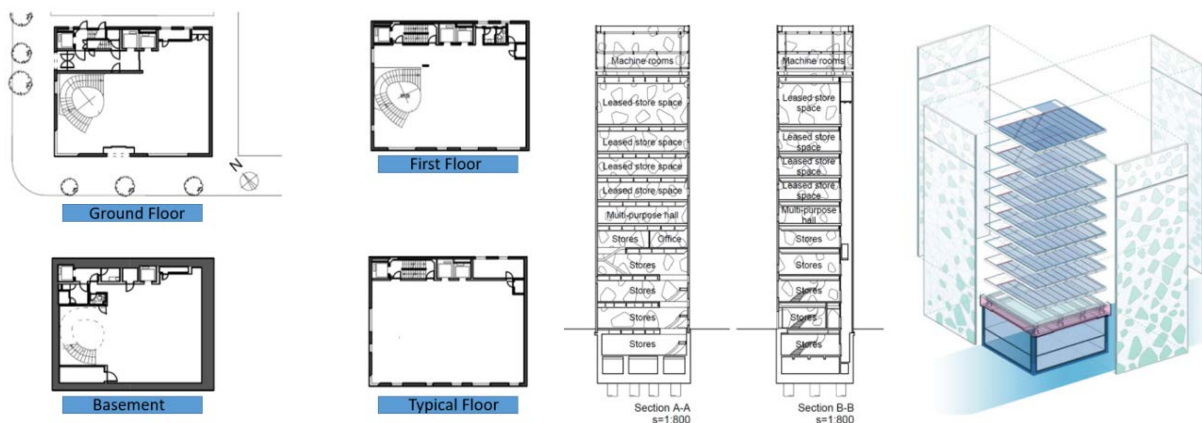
Mikimoto Ginza 2, the basement, ground floor, first floor, typical floor and the elevation view
